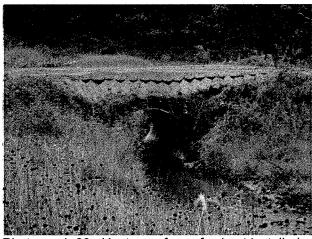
Looking downstream at log vane, root wads, and log toe protection installed between LT Stations 9+44 and 10+30. (9/27/04)
